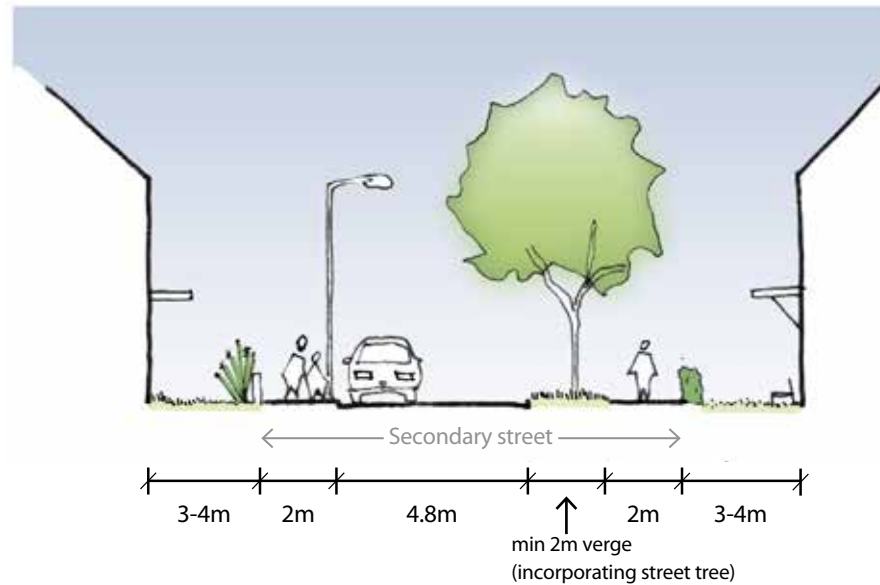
C-C – indicative, typical secondary street cross section (refer to Fig. 17 for section location)
